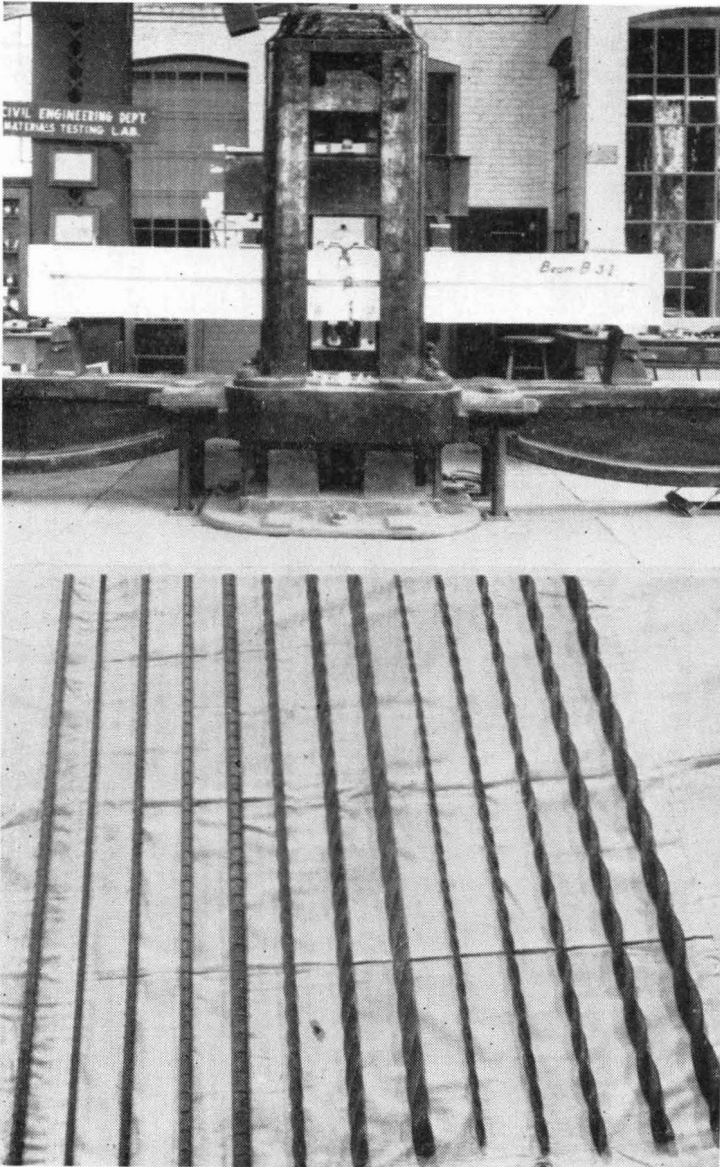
(TOP)—TYPICAL BEAM IN TESTING MACHINE
